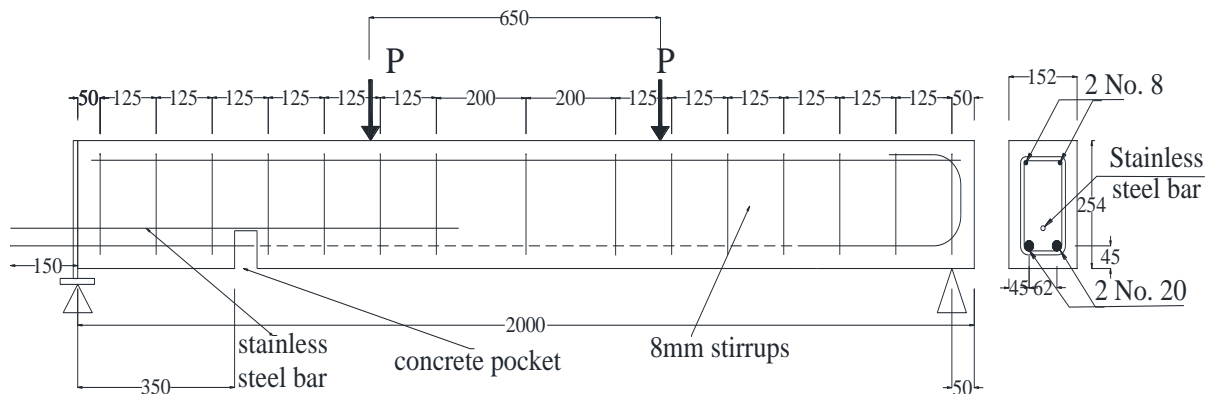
Beams with stirrup configuration A*; 125 mm spacing between stirrups in the shear zone. All dimensions are in mm.
